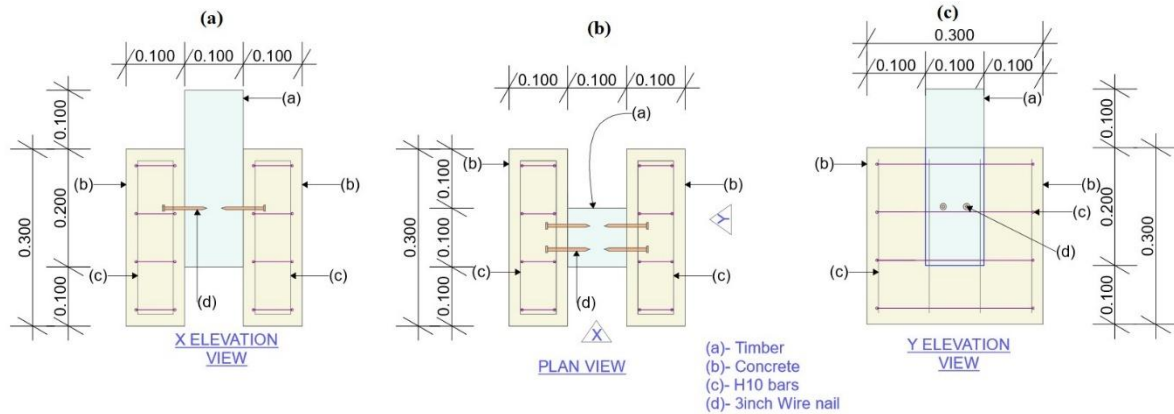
Shear connector experiment setup for the nails (a) Elevation X, (b) Plan view and (c) Elevation Y
